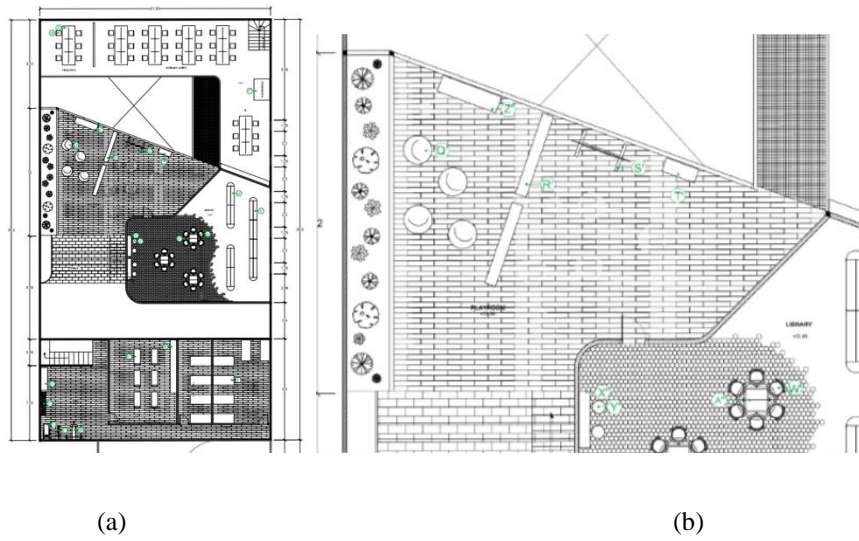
Second floor plan of 24Slides office (a) and detail of relaxation floor plan (b).
